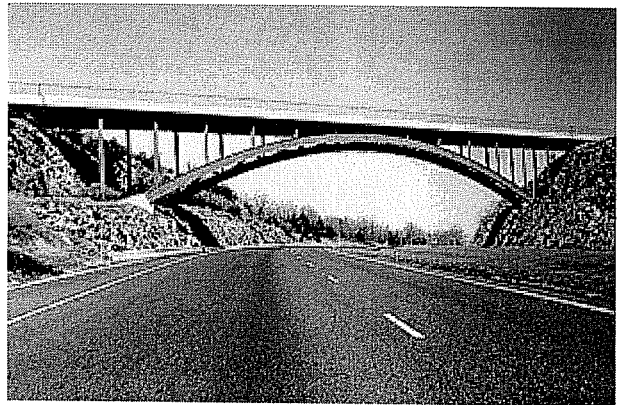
42 An arch bridge taking advantage of the natural abutments
